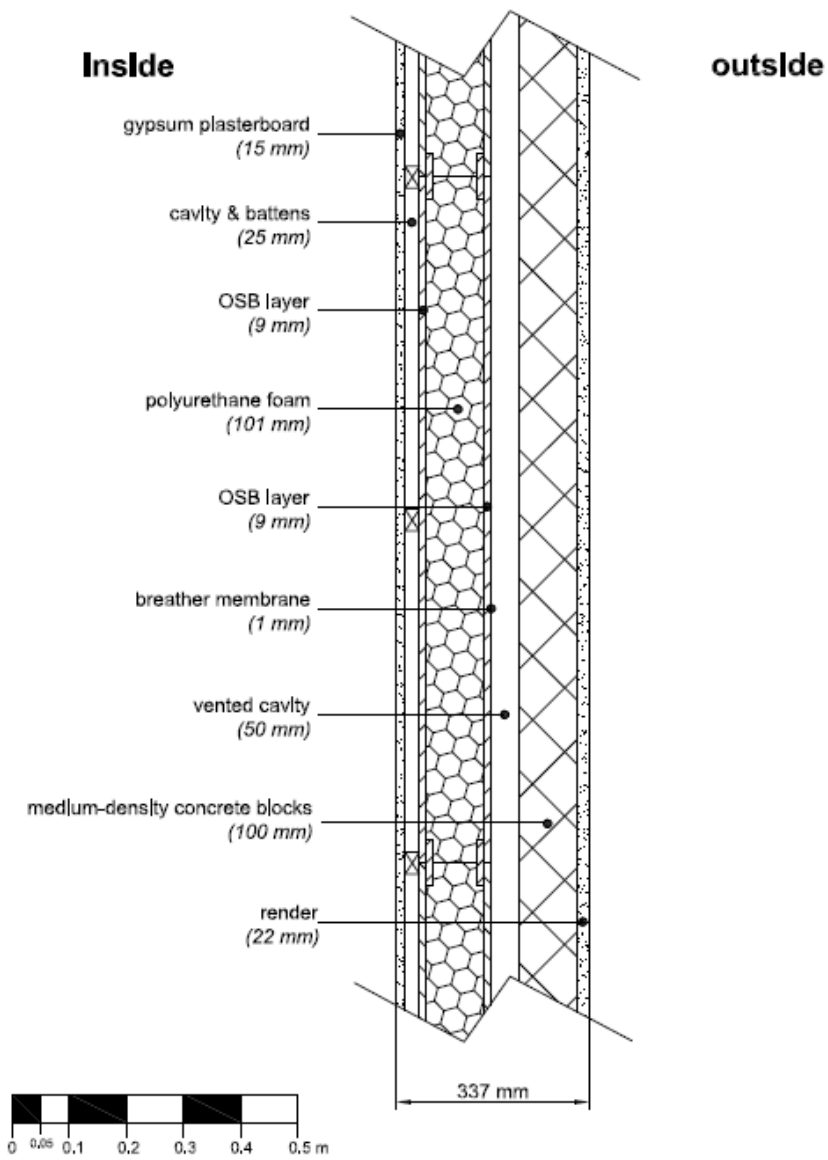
Wall C1 (structural insulated panels (SIPs), external solution: render on blockwork), horizontal section.
